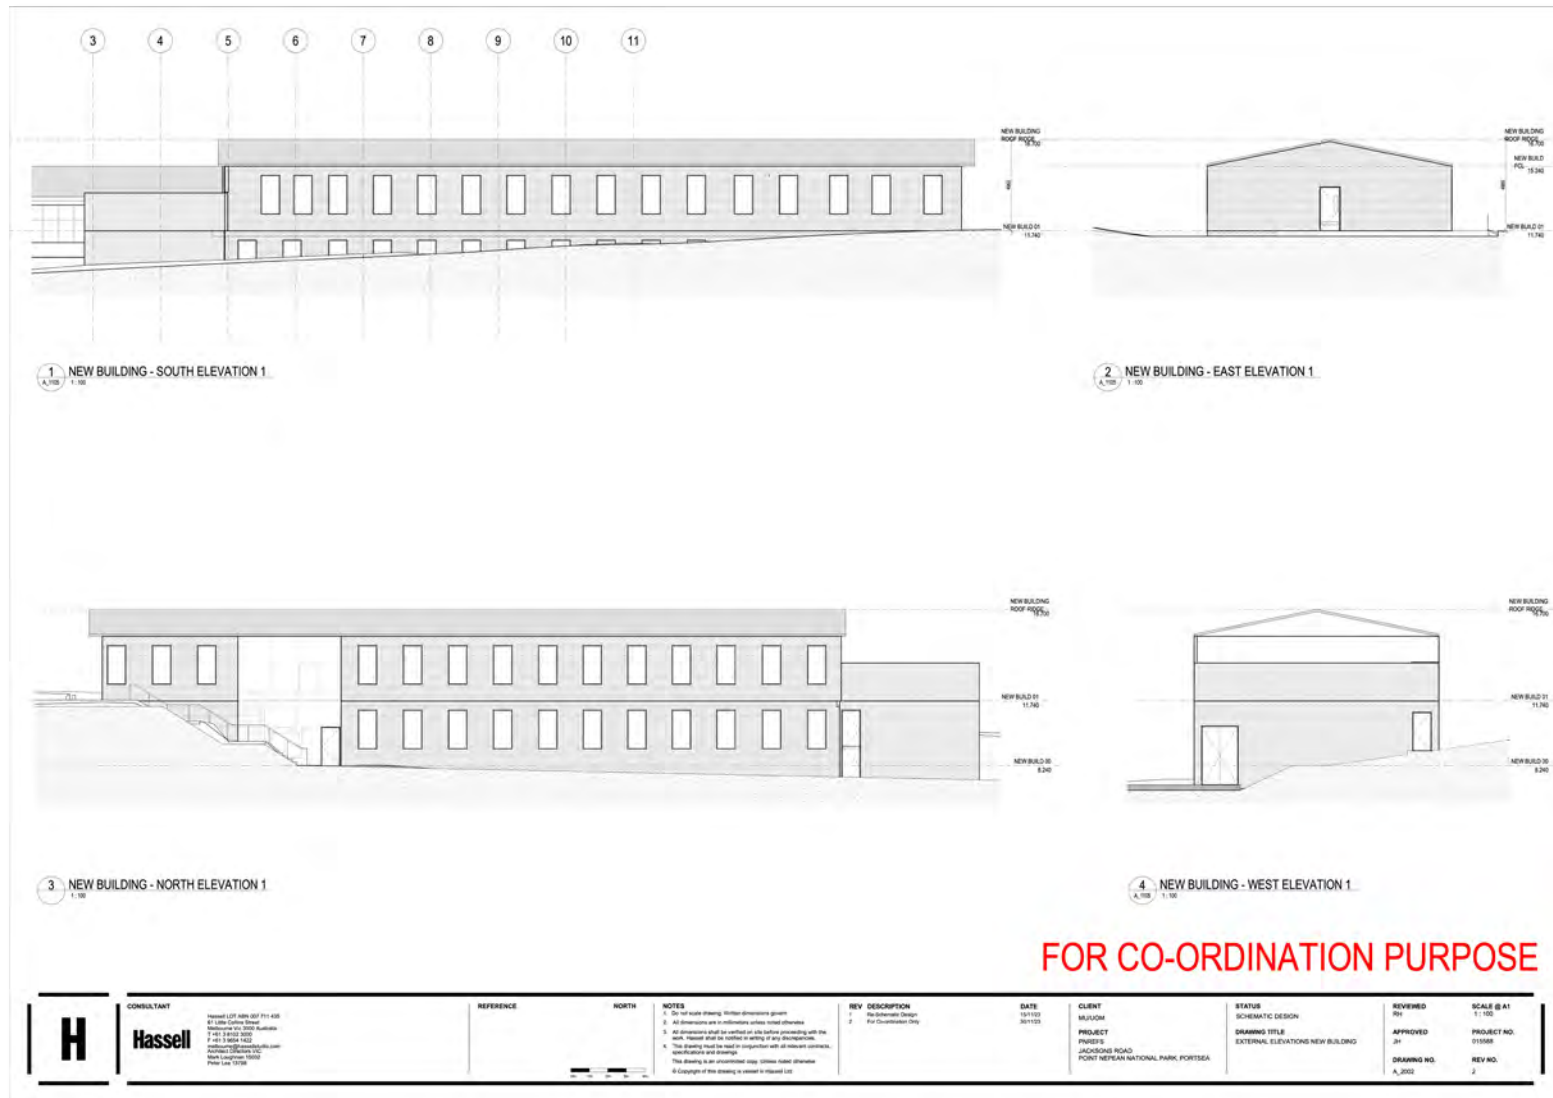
Development Plan Profile showing proposed new accommodation building. Document provided by UoM.
